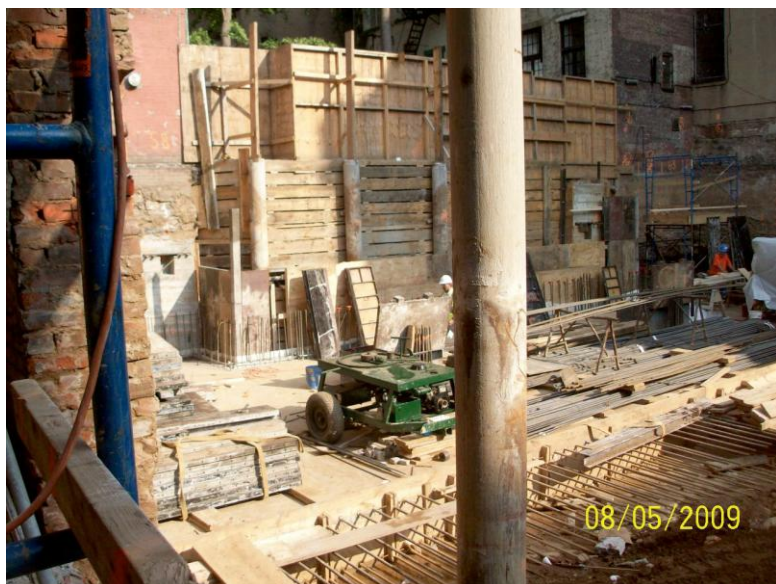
Show the Sheeting (Lagging) and Piles on the West Side (Mac Dougal Street)
